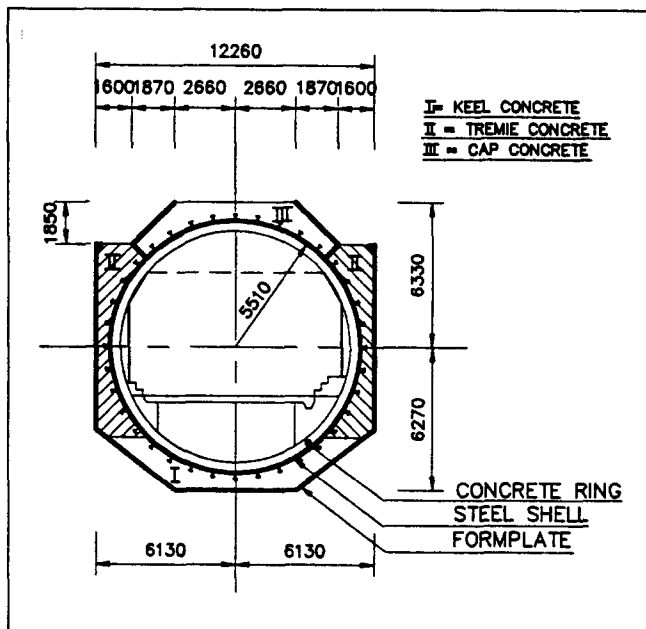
Typical cross-section of a double-steel-shell tunnel.
